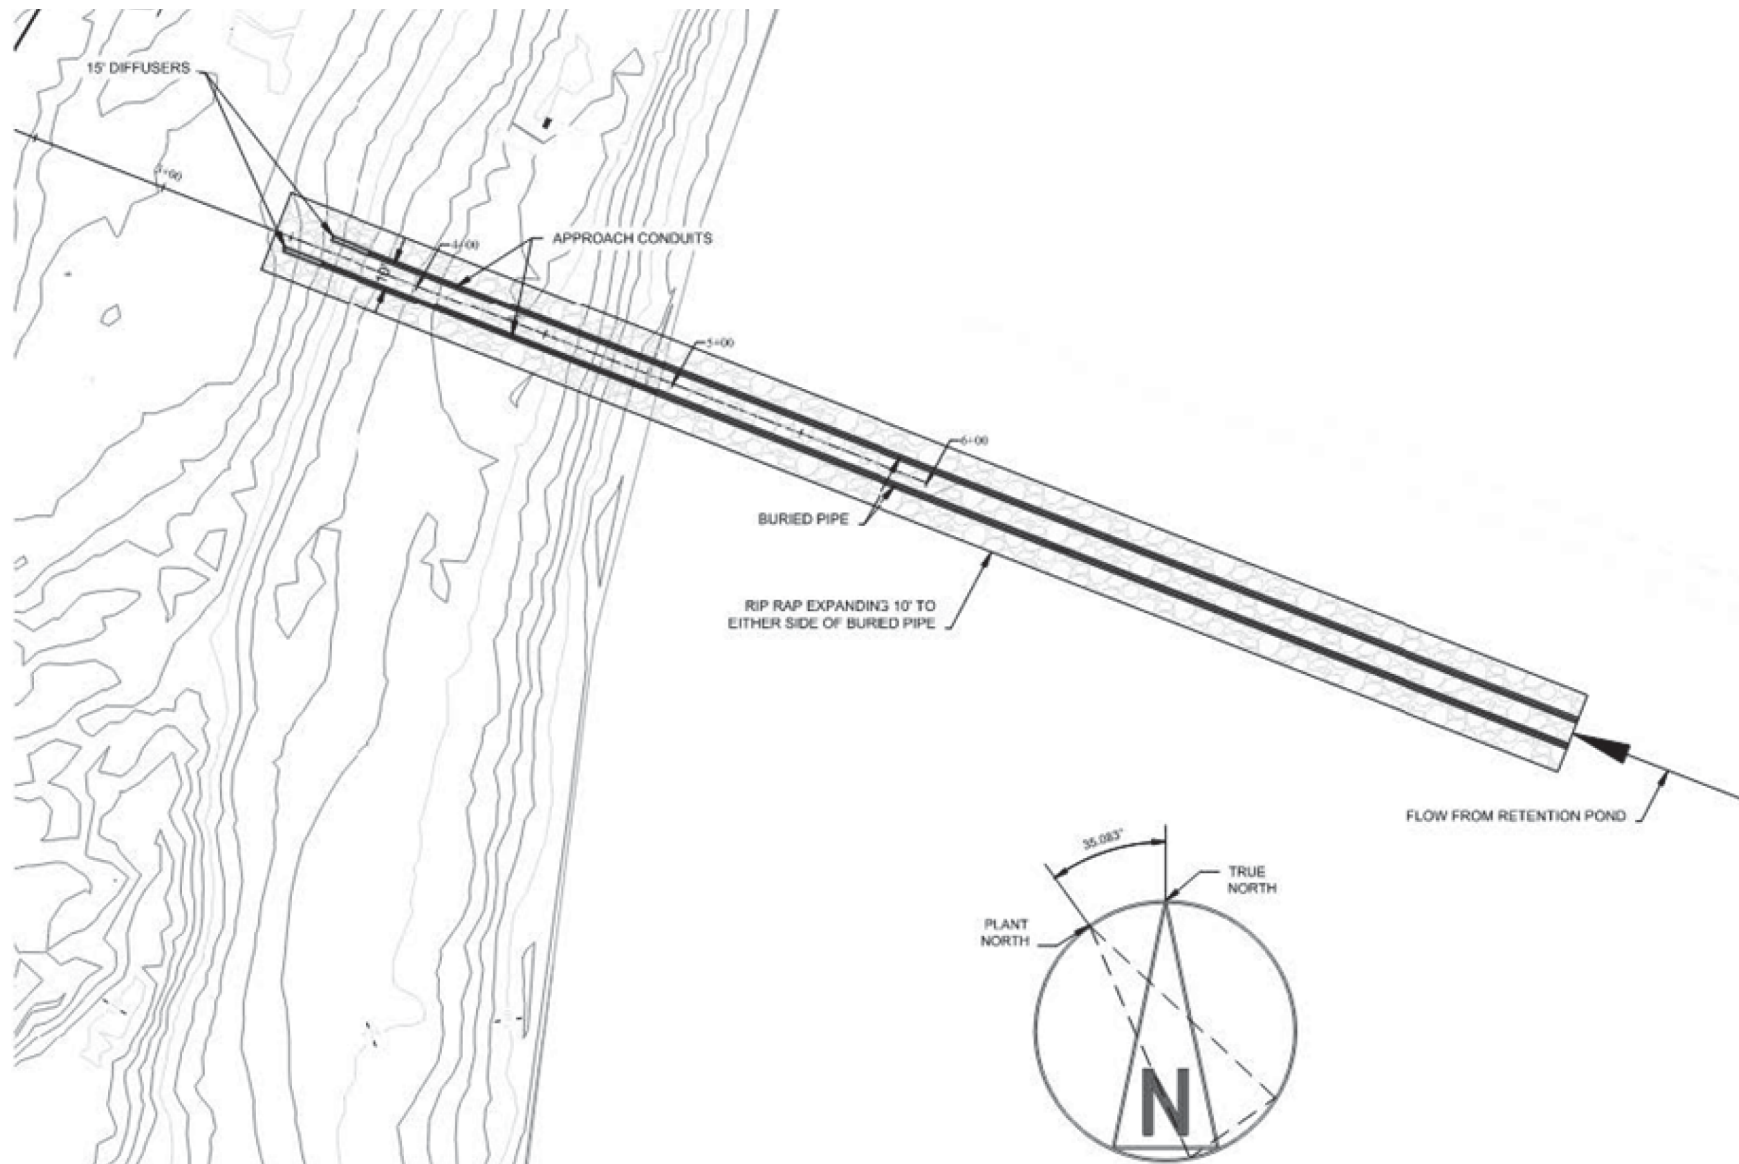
Diffuser and Discharge Piping Plan View
